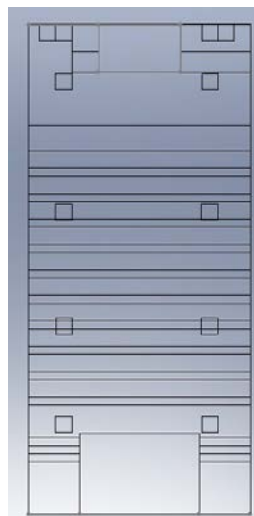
Layout plan for DK4 with diffusers and return air duct.
